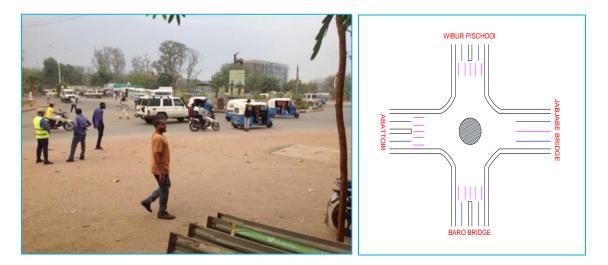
Ajwomara Roundabout (picture and layout view)
